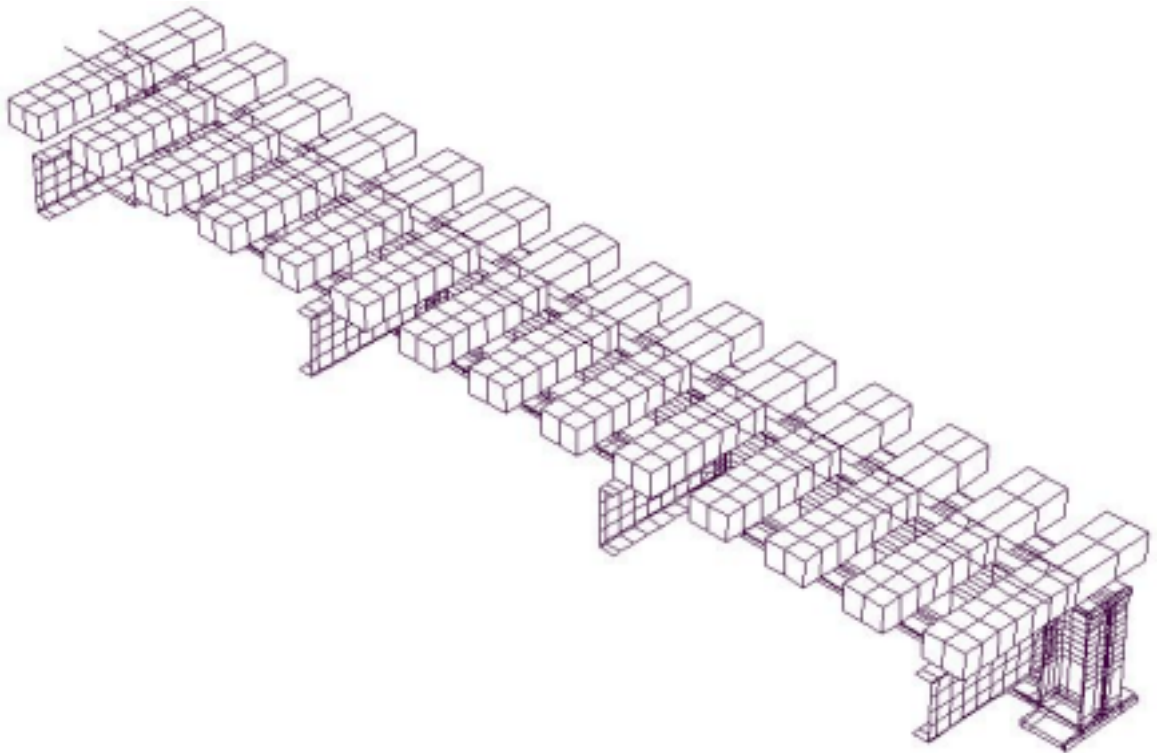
Symmetrical high detail finite element model of a steel girder bridge.
